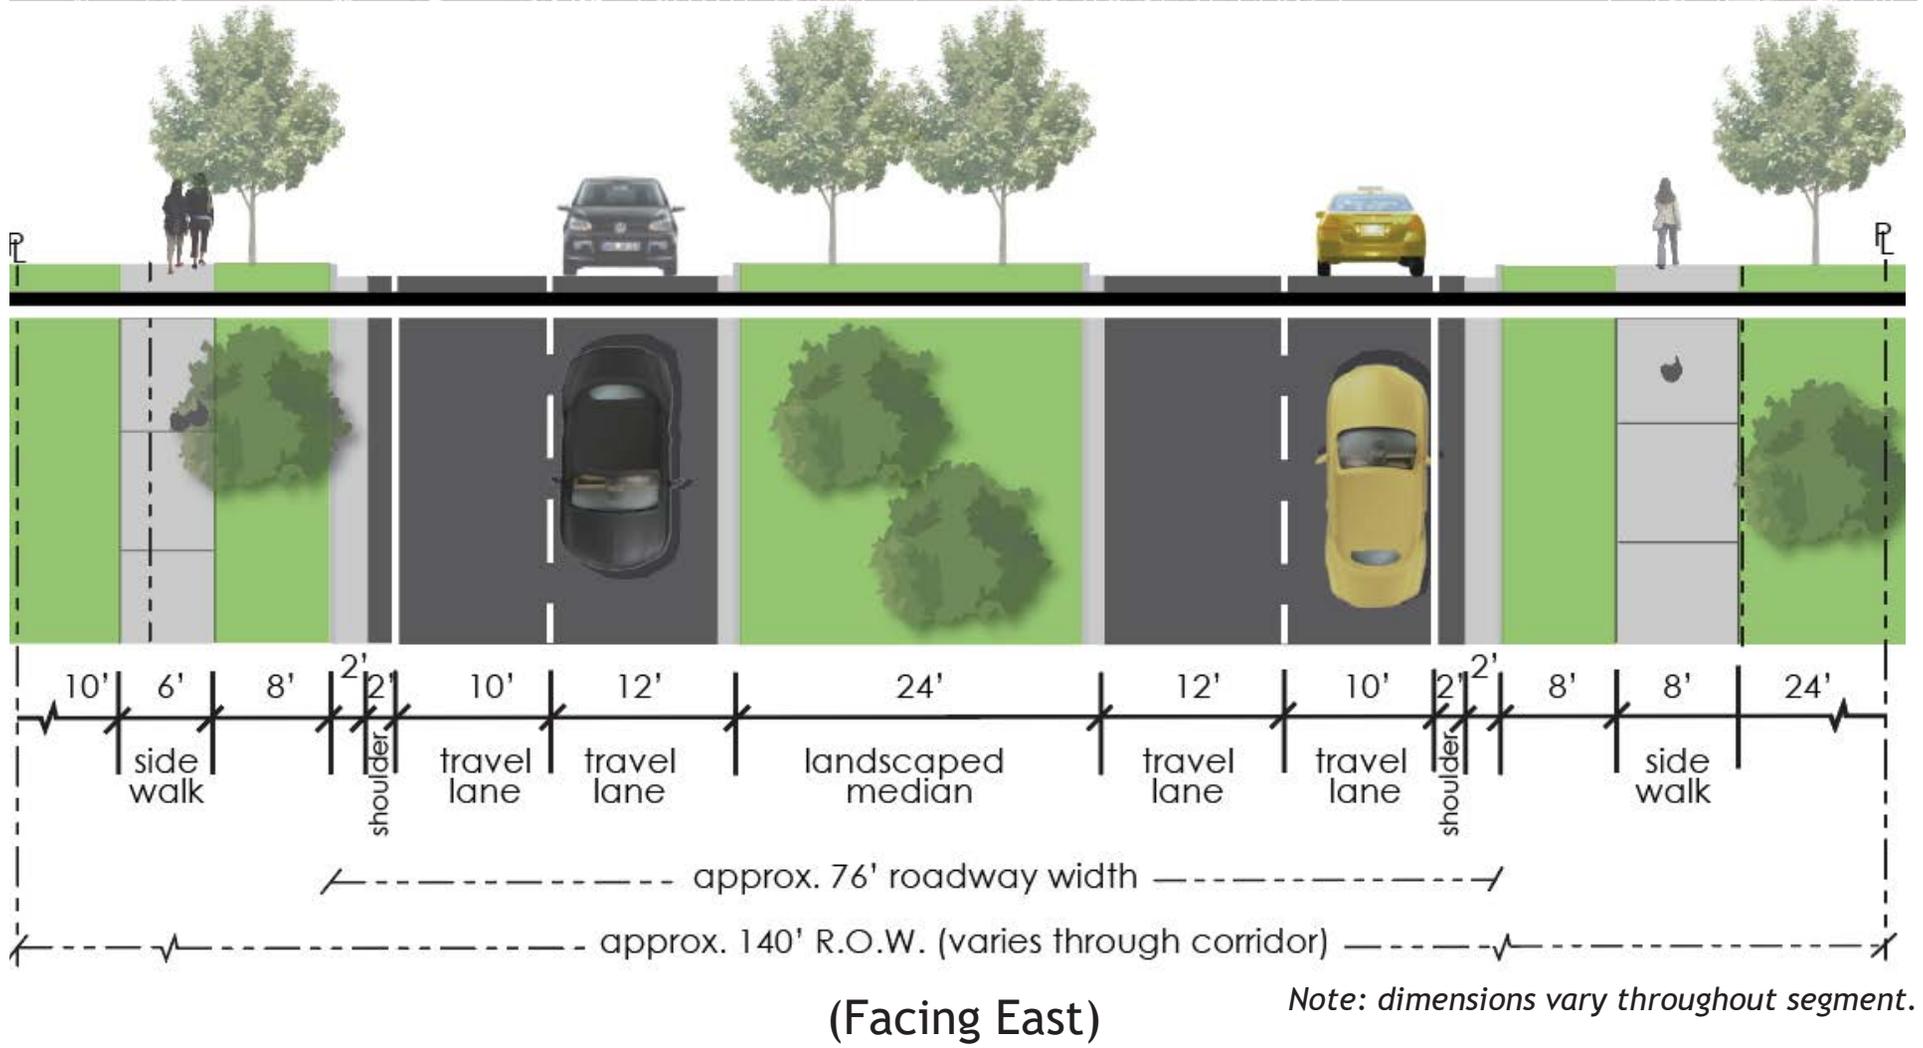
Lowell Blvd St to Zuni St Existing Cross Section
